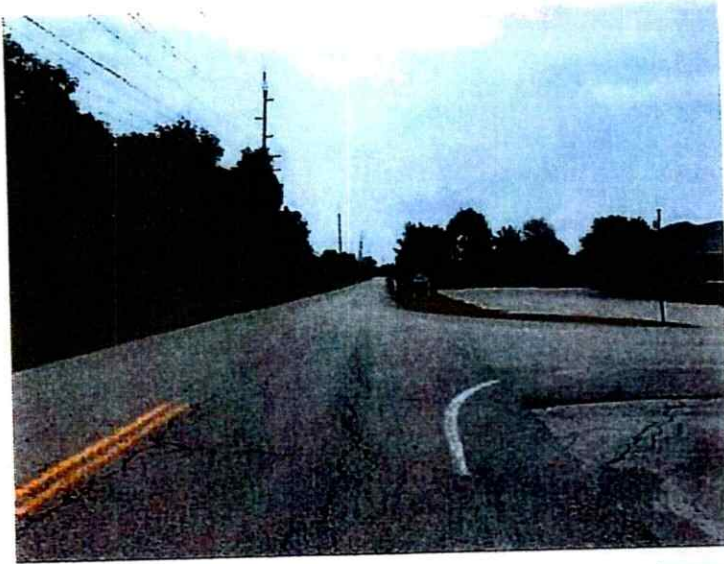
East façade and parking lot facing Commercial Drive
